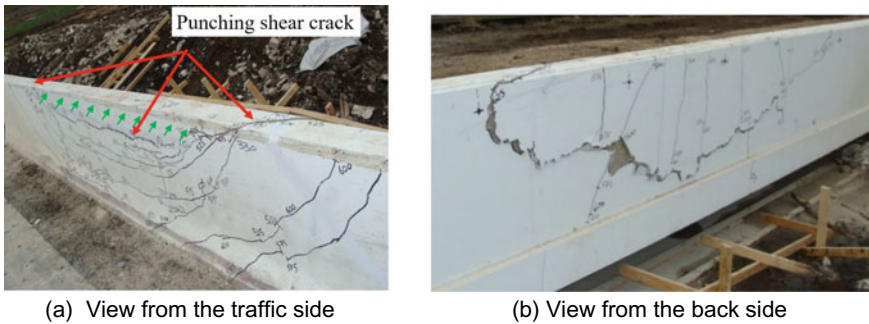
Crack pattern and punching shear failure of a TL-5 GFRP-reinforced barrier
